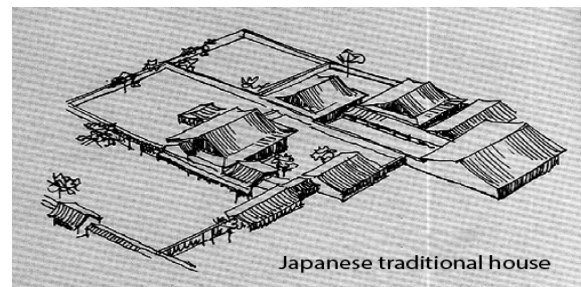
Typical layout of Japanese traditional house (Schoenauer, 1962).
